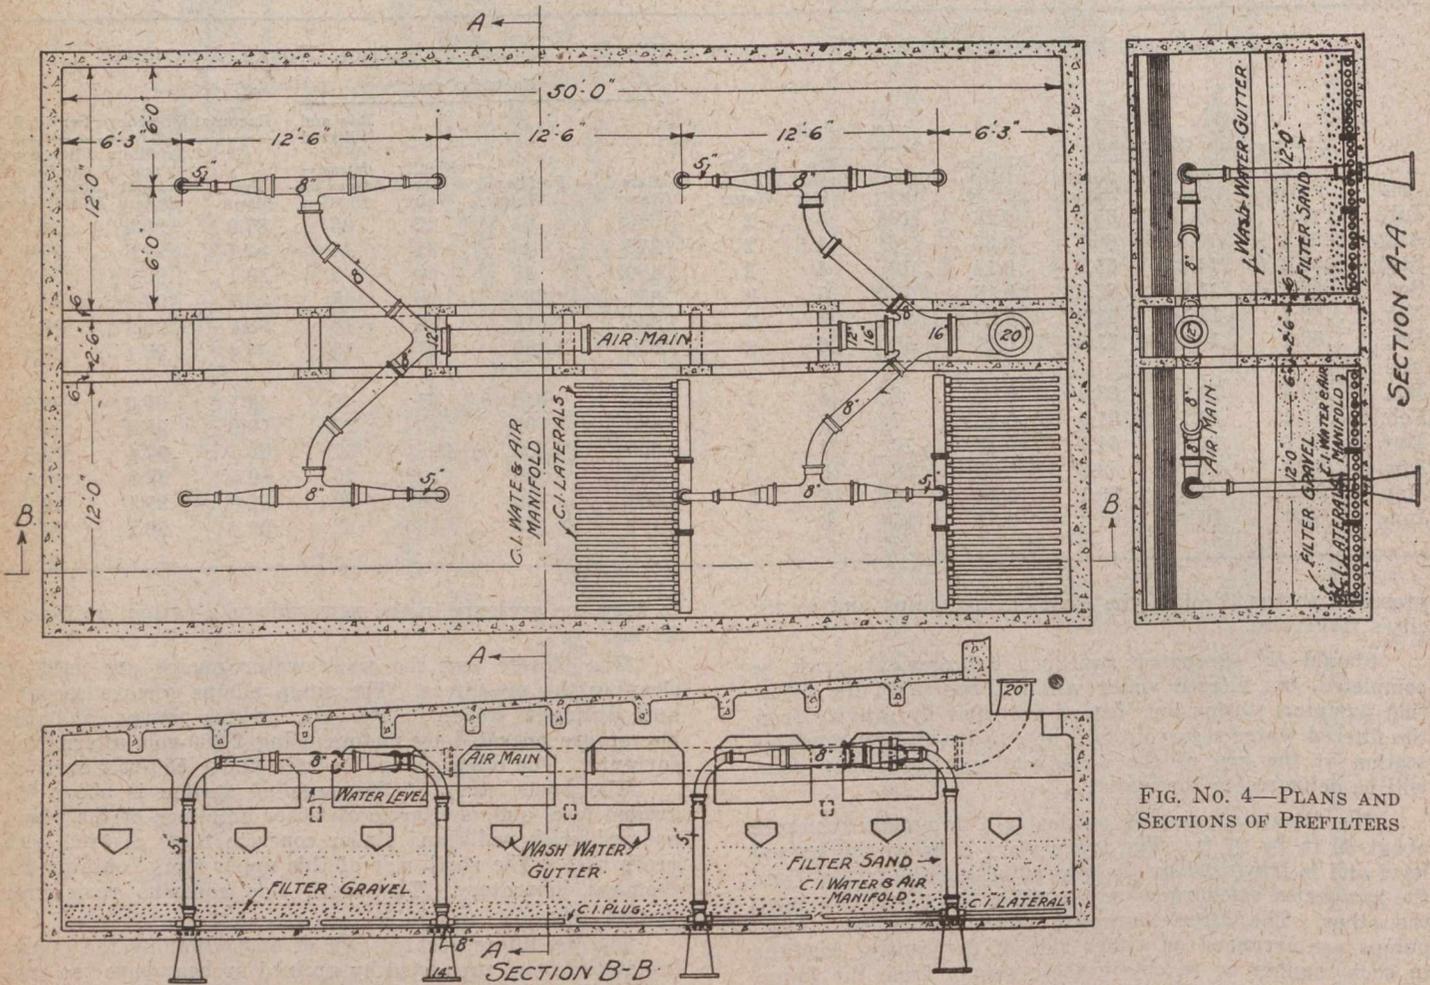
PLANS AND SECTIONS OF PREFILTERS
